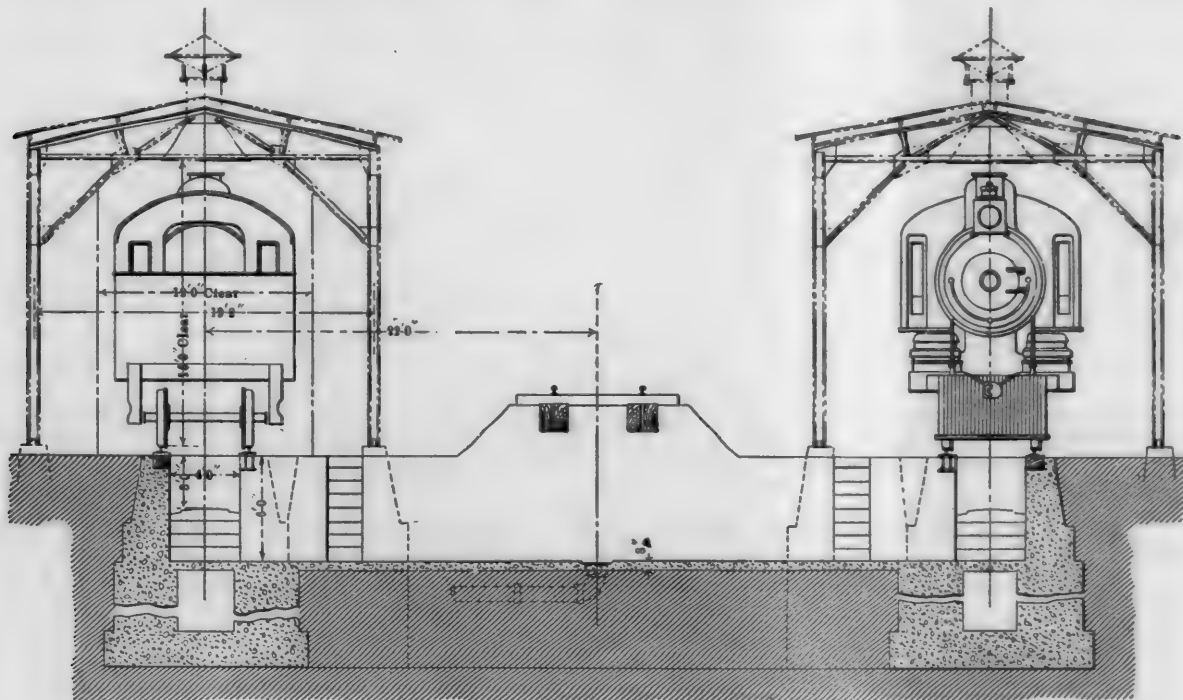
CROSS SECTION AT INSPECTION PITS, SHOWING CONNECTING PASSAGEWAY.
